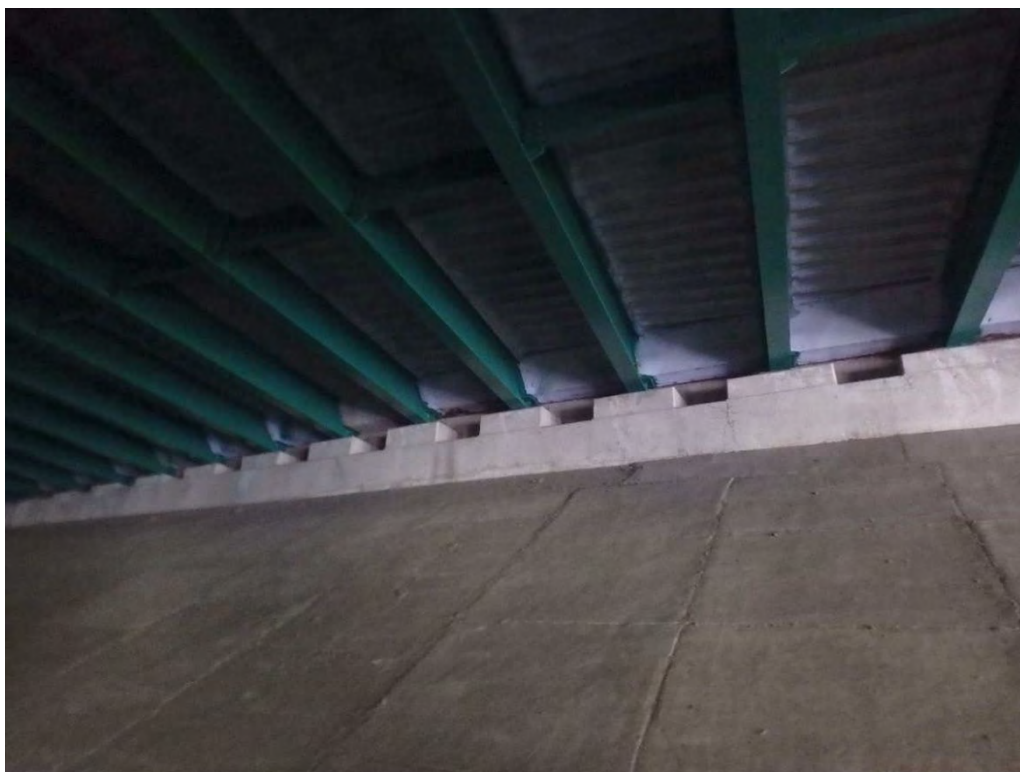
Tuckerman Lane (081010) – Looking at south abutment
